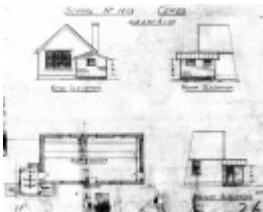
Plan and Elevation Drawings, Ceres State School no. 1602, n.d. (c.1948) showing original roof form and early cloakroom. Source: Drawing SSN 1602.1, Public Record Office Victoria.
